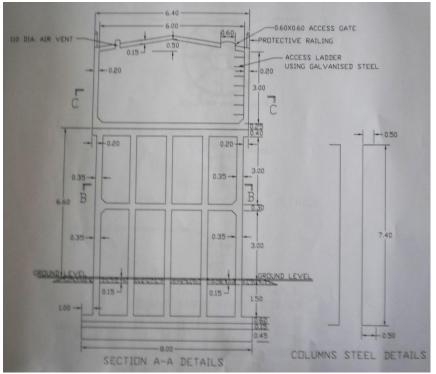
AutoCAD drawing of the Elevated Reservoir
